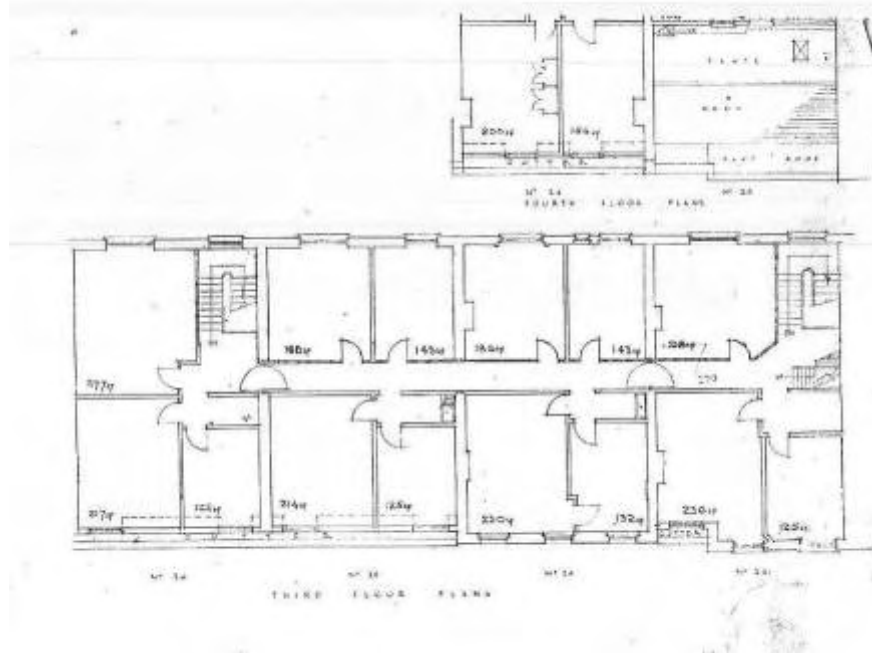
Extract of Ministry of Works plans 1946, Third Floor plan for Chester Terrace Nos. 26 – 24. Crown Estate Archive.
